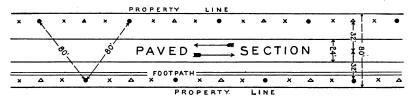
An 80-foot right-of-way with a 24-foot roadway planted formally. The tree rows are 32 feet back from the center line of the road, and the trees are planted 80 feet apart across the road, or practically 100 feet apart in the rows. Tall shrubs are planted midway between the trees (\triangle) and smaller shrubs between the tall shrubs and the trees (X).
